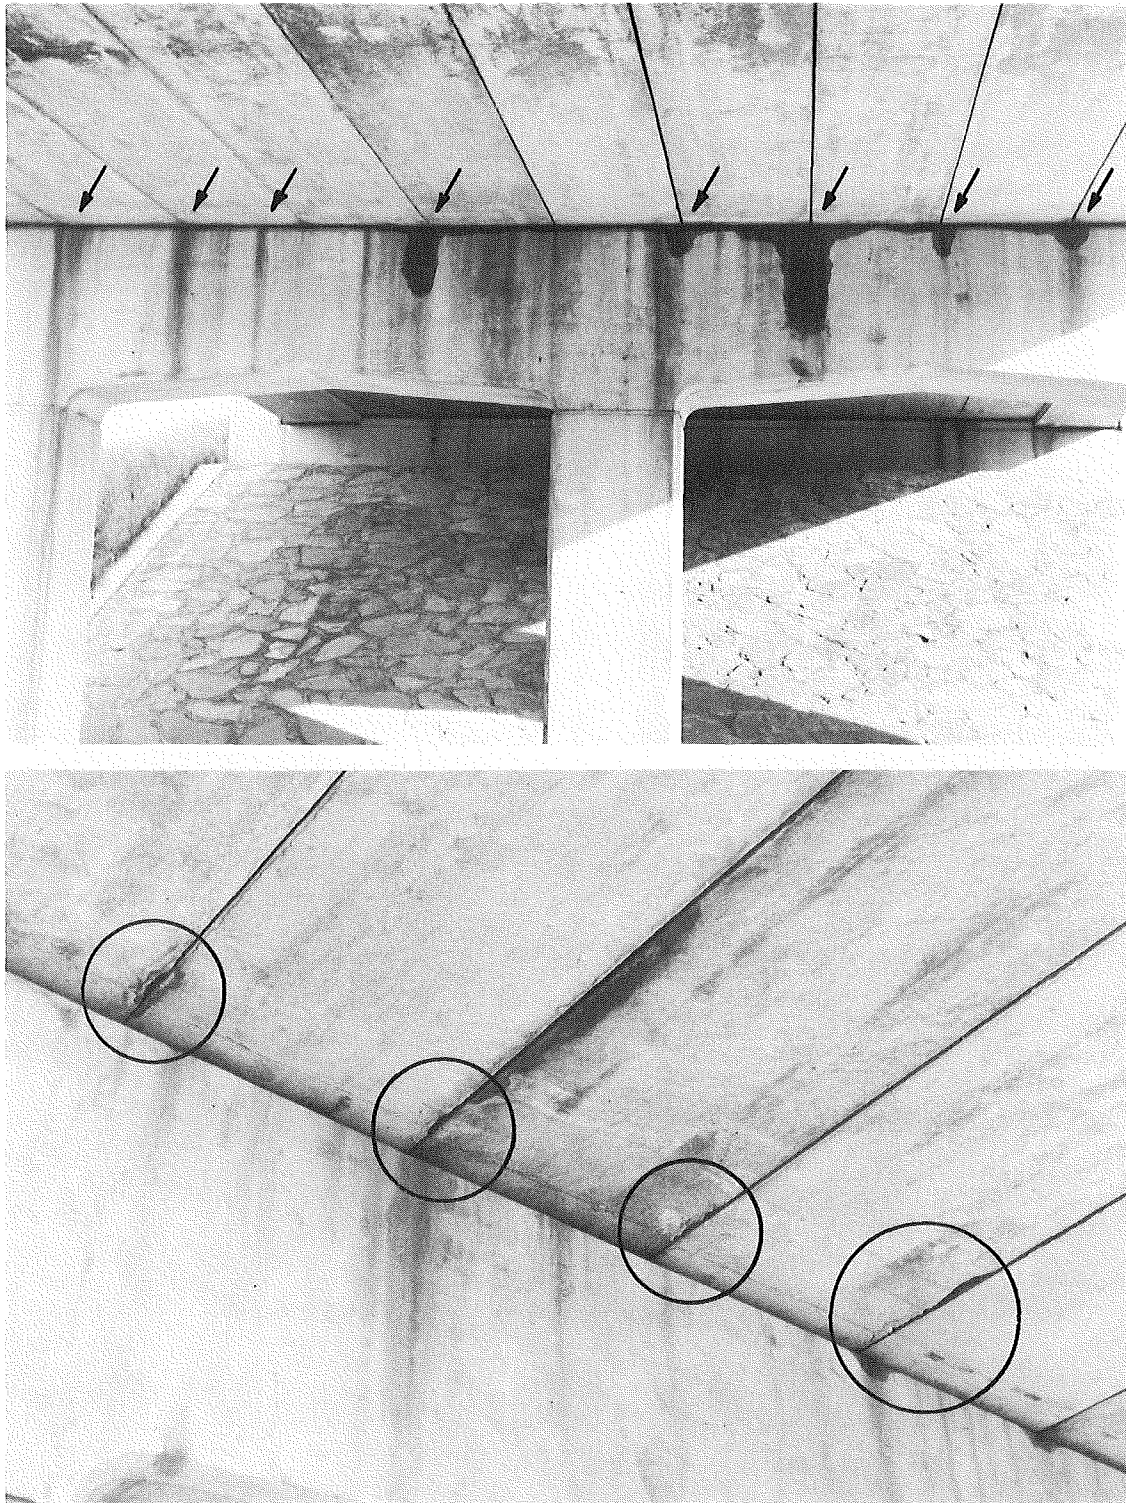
Condition of underside of beams after several days without rain, showing water draining from within the beam structure (top) and deterioration at beam corners (bottom) (9-27-60).
